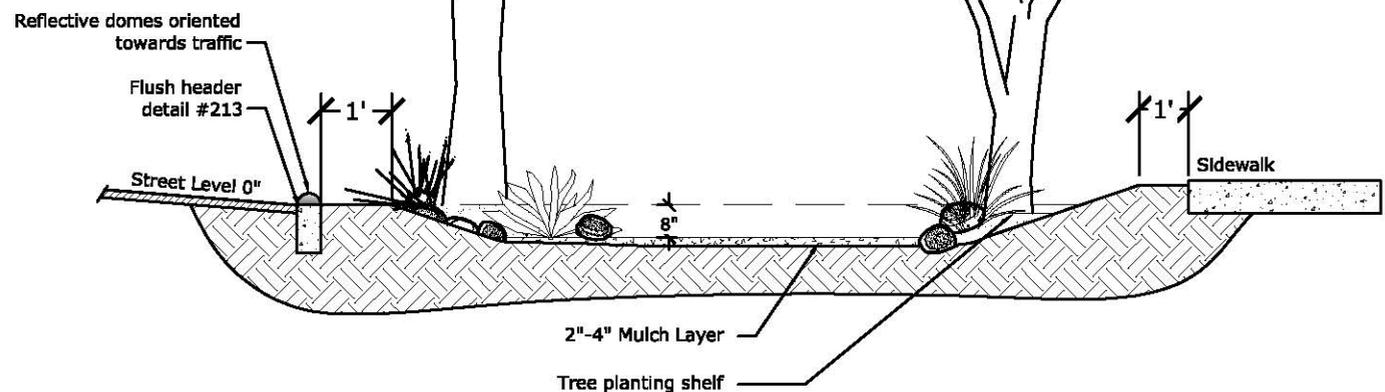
Typical cross-section of a street width reduction with flush curbs and depressed bioretention area. For plan view, see Appendix.
